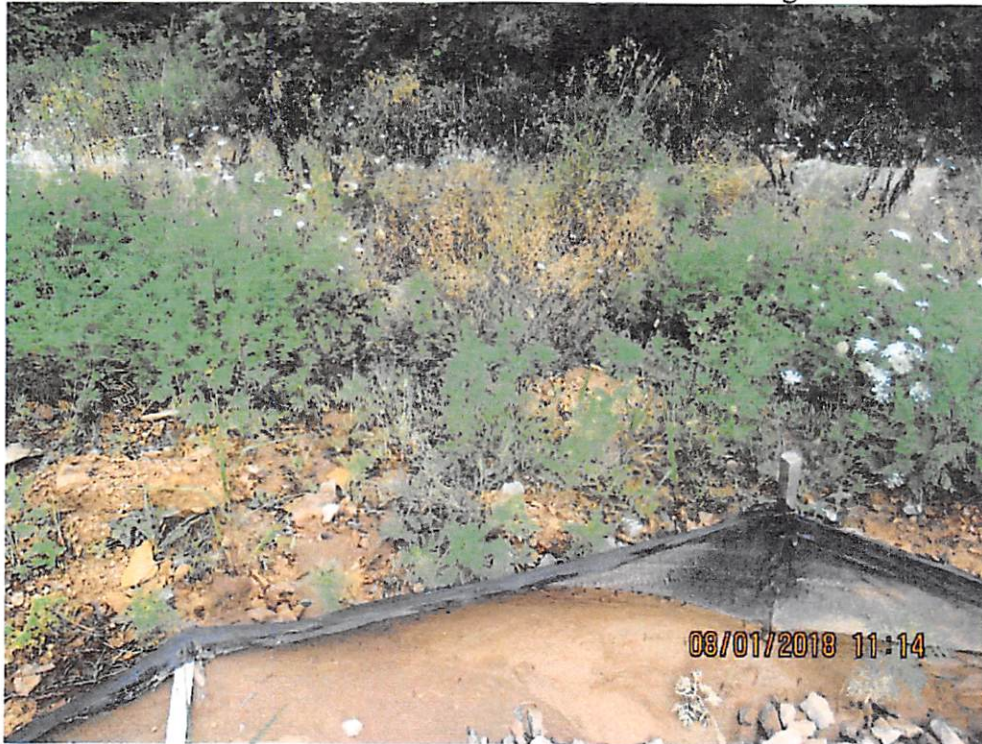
Sediment and erosion occurring down-gradient of improperly installed silt fence.
